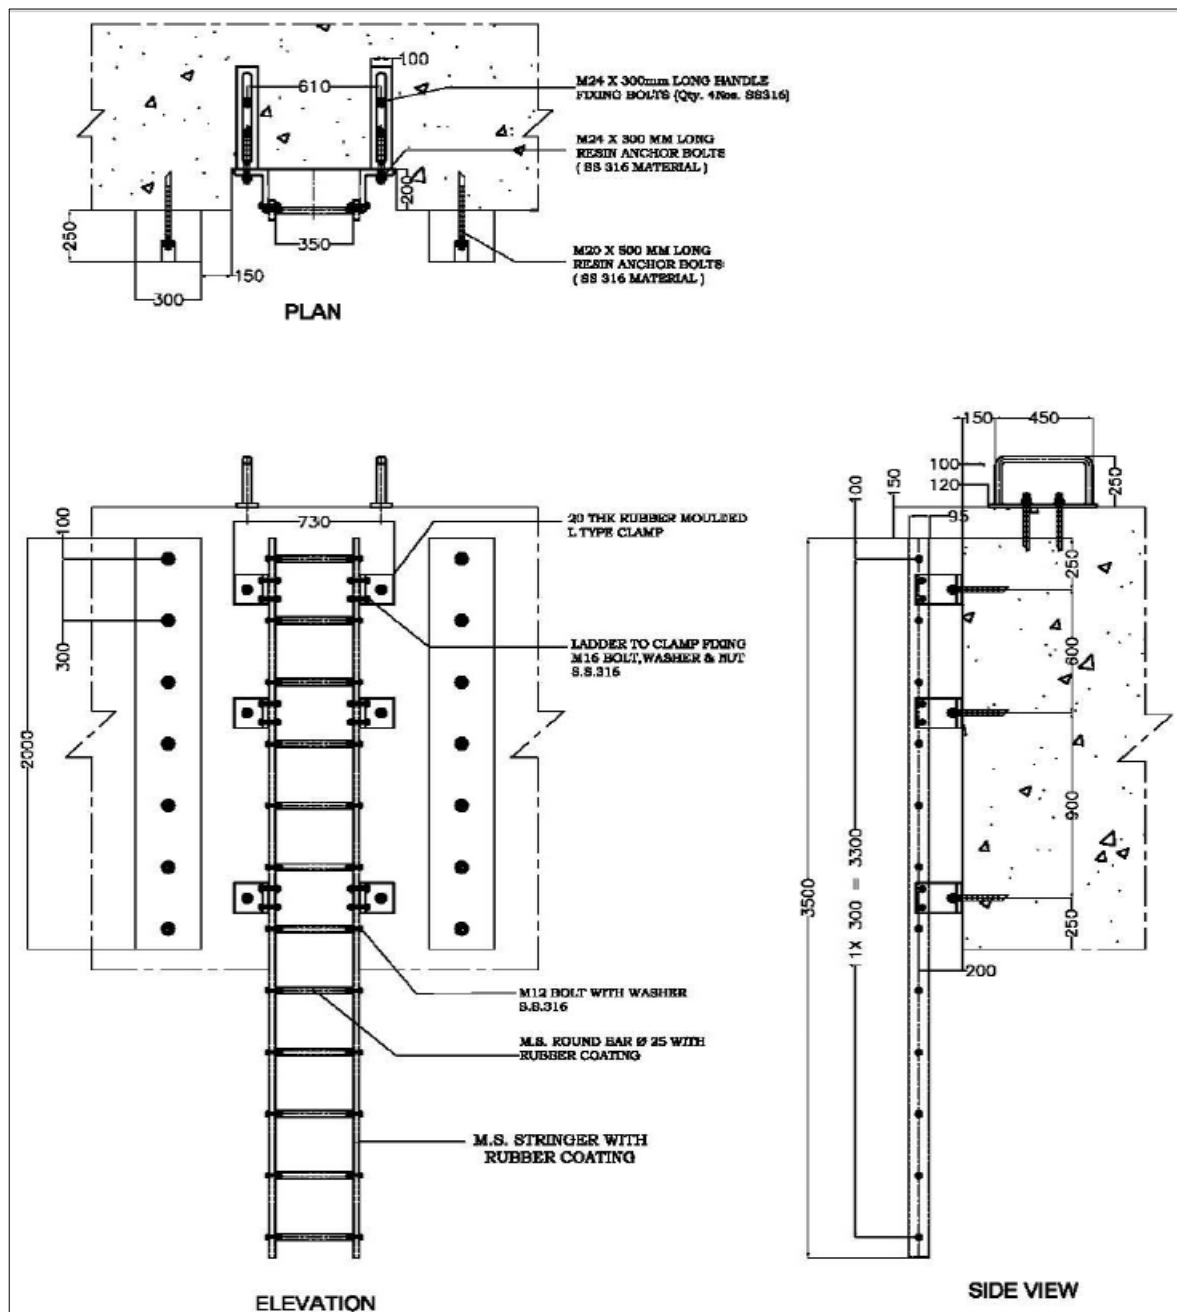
Tentative details of Rubber Moulded ladder to be fixed (Dimensions are tentative)
